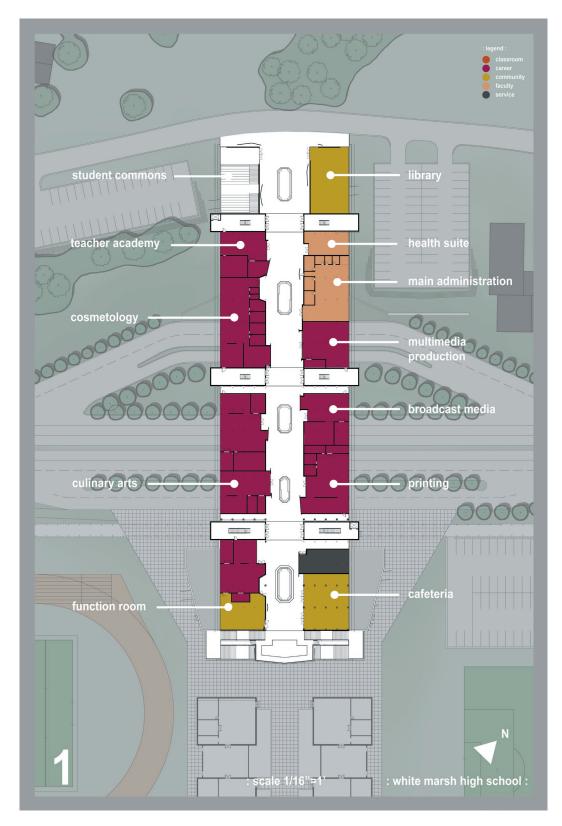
Formal review presentation graphic. First floor plan of proposed high school.
